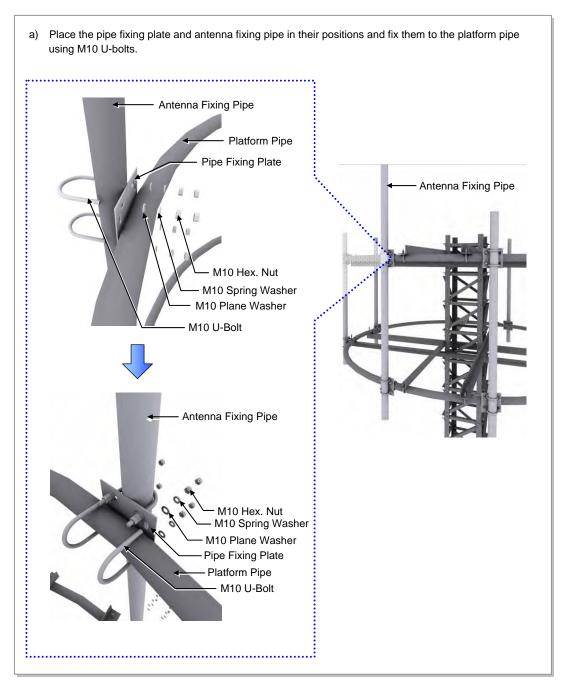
Fixing Tower Type RRH-2WB (7)
